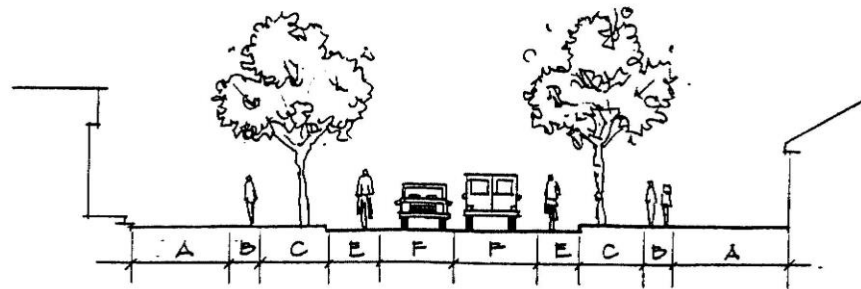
Schematic sketch of a typical sub-collector street cross-section. Table 1 lists the recommended dimensions of each component: A) building setback from street right-of-way; B) walkway; C) planting area; E) bicycle lane; F) travel lane.
